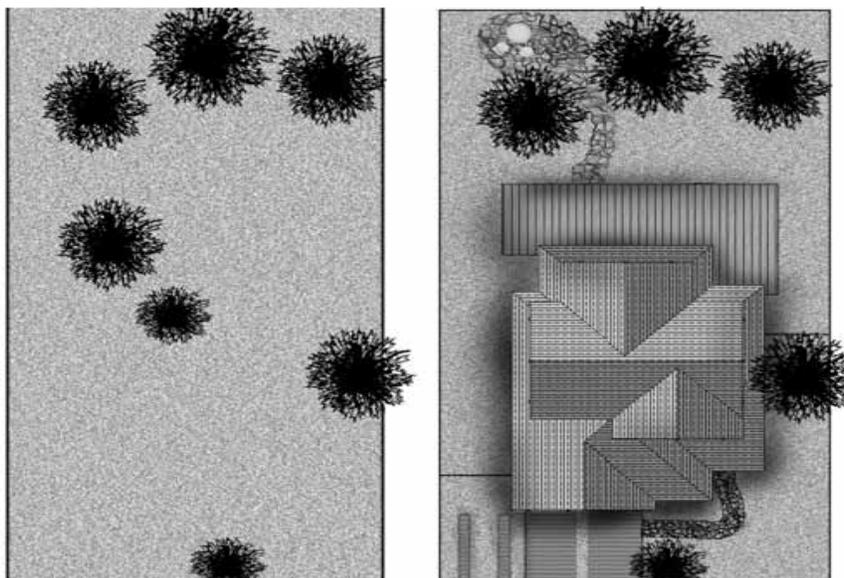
The revised design mitigates bulk by stepping down with the slope and breaking long continuous roof and building walls into smaller elements.
